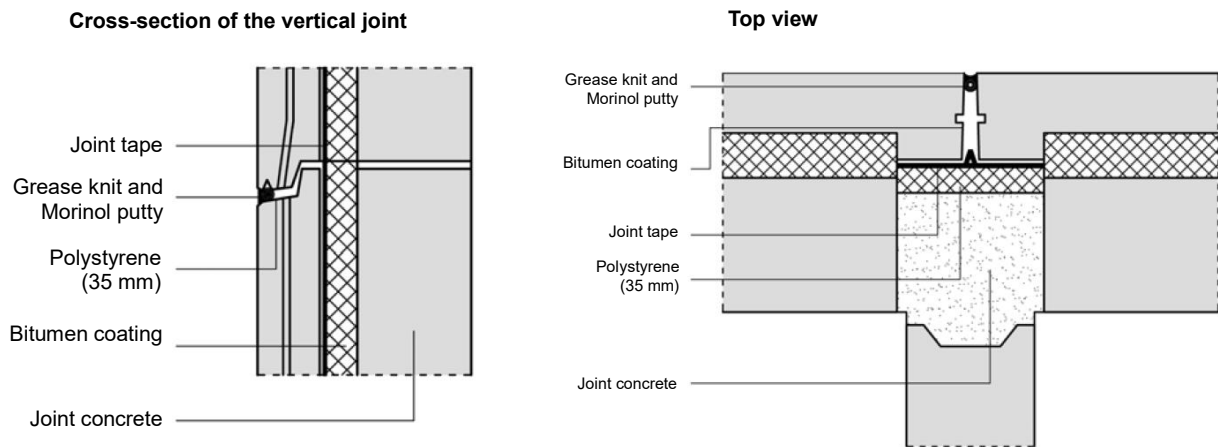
Connection outer walls - inner wall<sup>48</sup>
